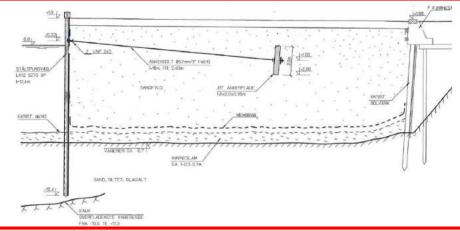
Cross section of assumed geometry of existing outlet structure adjacent to shaft.
